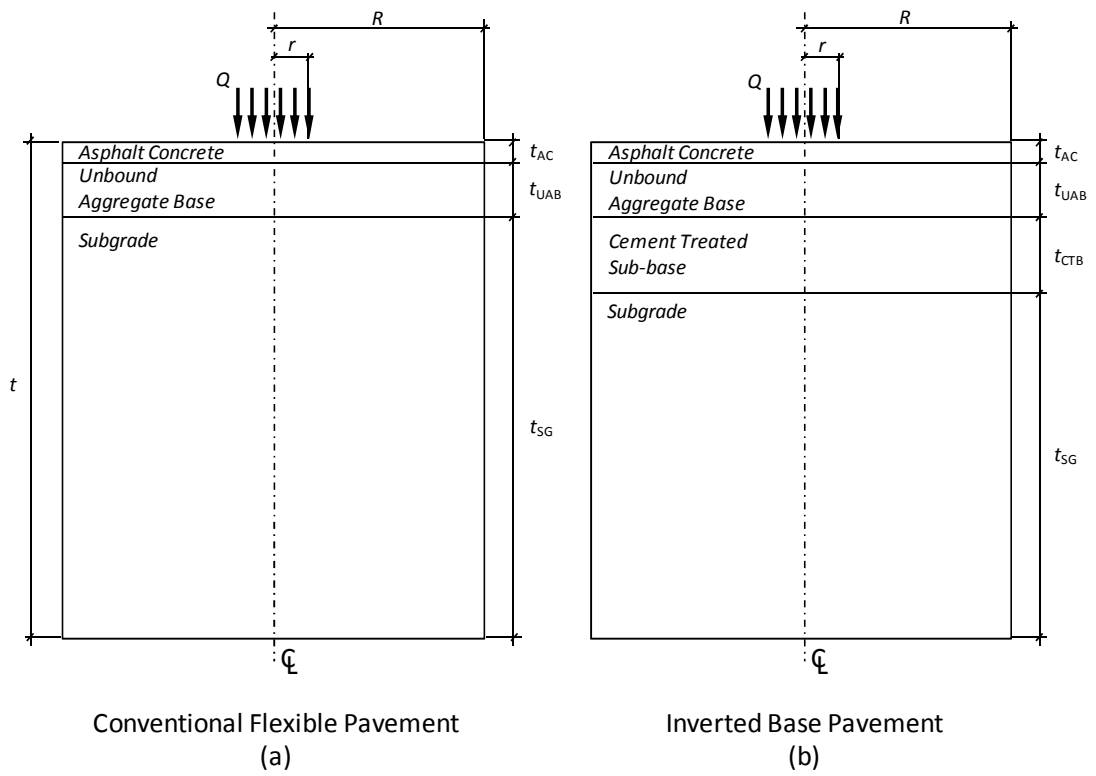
Conventional flexible pavement (a) and (b) inverted base pavement structures.
